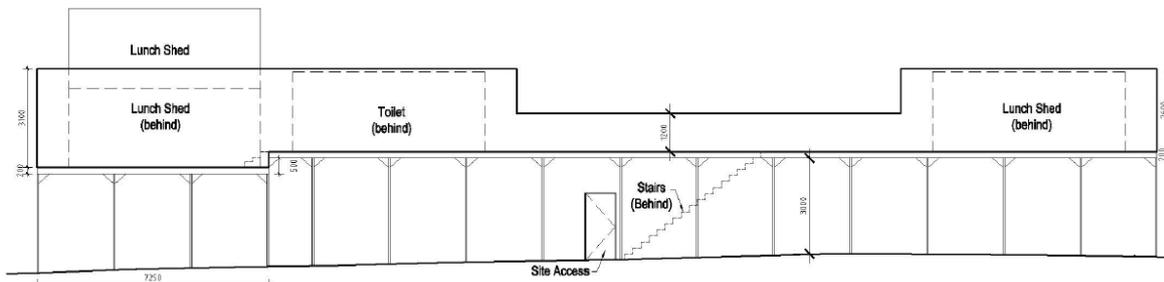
Typical Elevation for Type B Hoarding with Site Sheds
